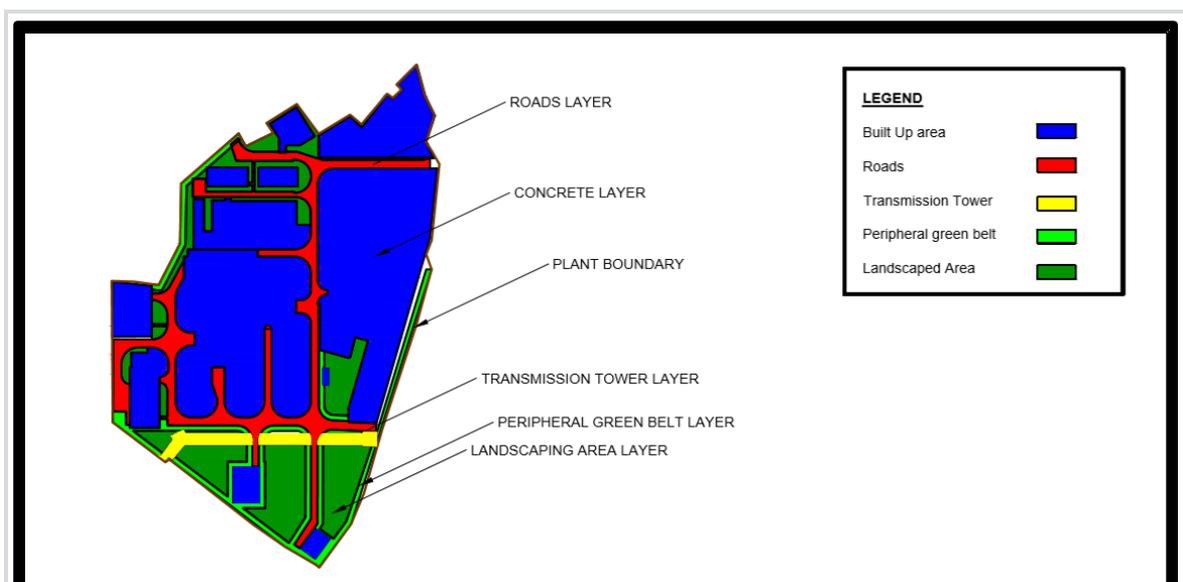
Site Layout Demarcating Plant, Utilities and Open Green Space
